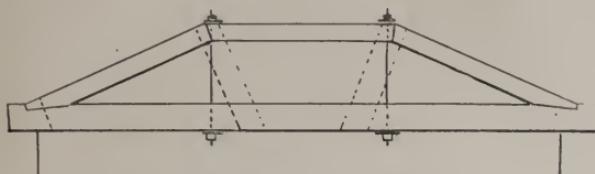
SIMPLE TRUSSSED BRIDGES.
